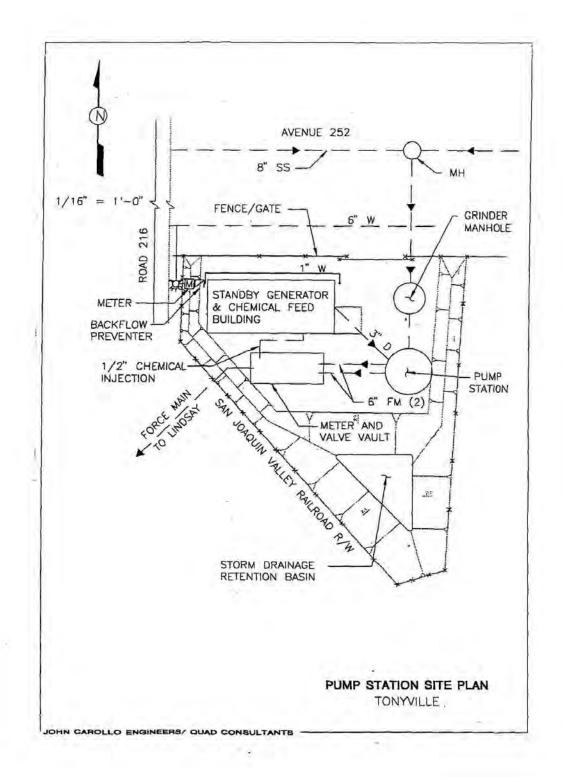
TONYVILLE PUMP STATION SITE PLAN
